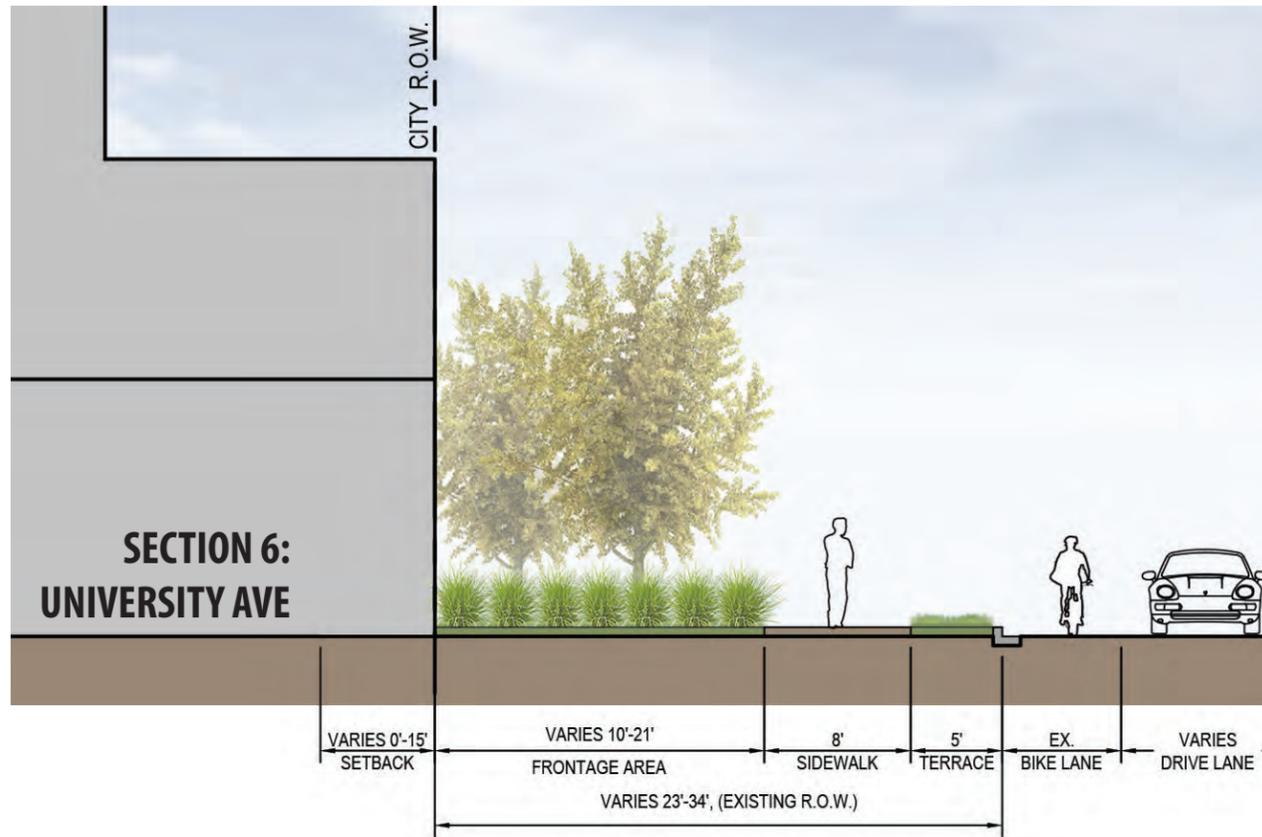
F - PROPOSED STREET SECTIONS - EXTERIOR
